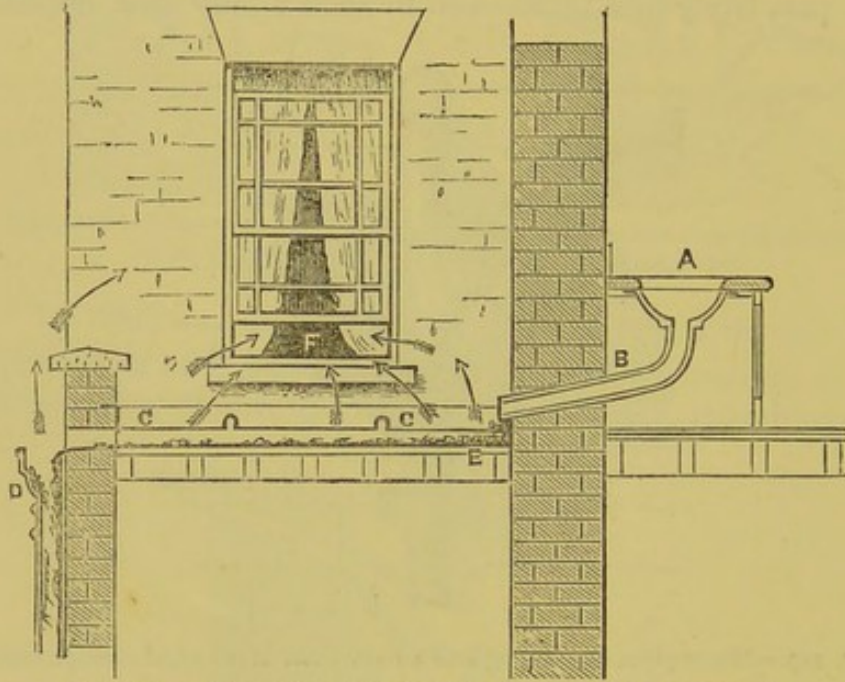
Waste-pipe emptying into Gutter—bad arrangement.
